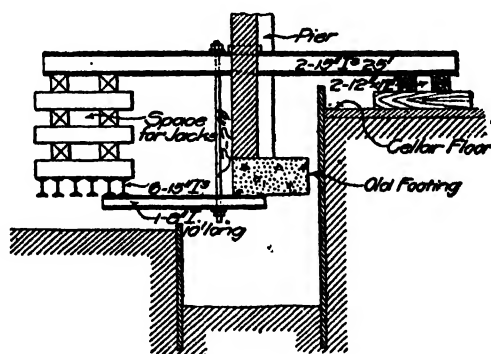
Suspended Support for Footing, Silversmith's Building, New York.
